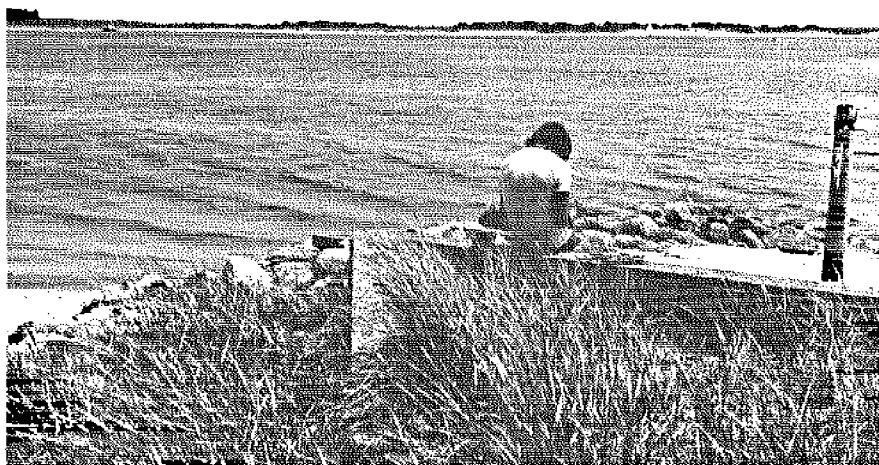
Sta. VIII. Groin 25 and end of wooden seawall. Note sand accumulation to southwest of groin.
